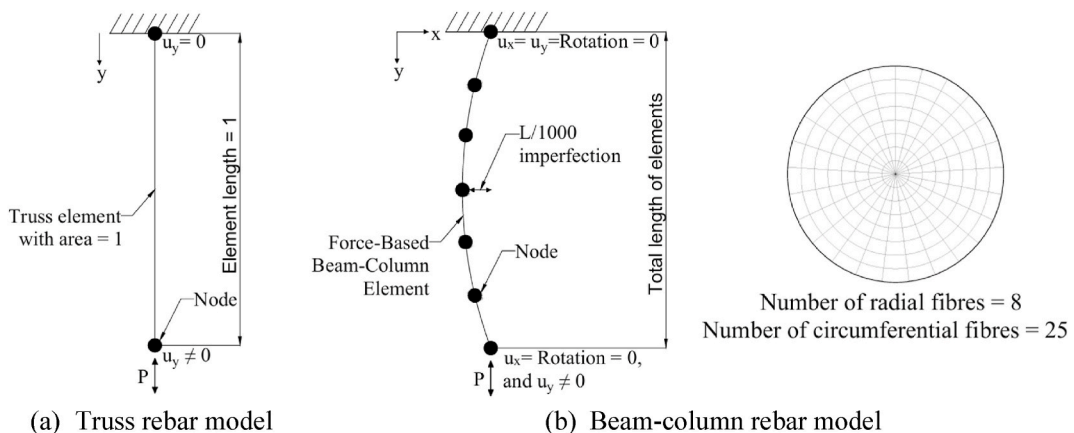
Schematic of truss and beam-column isolated steel rebar models.
